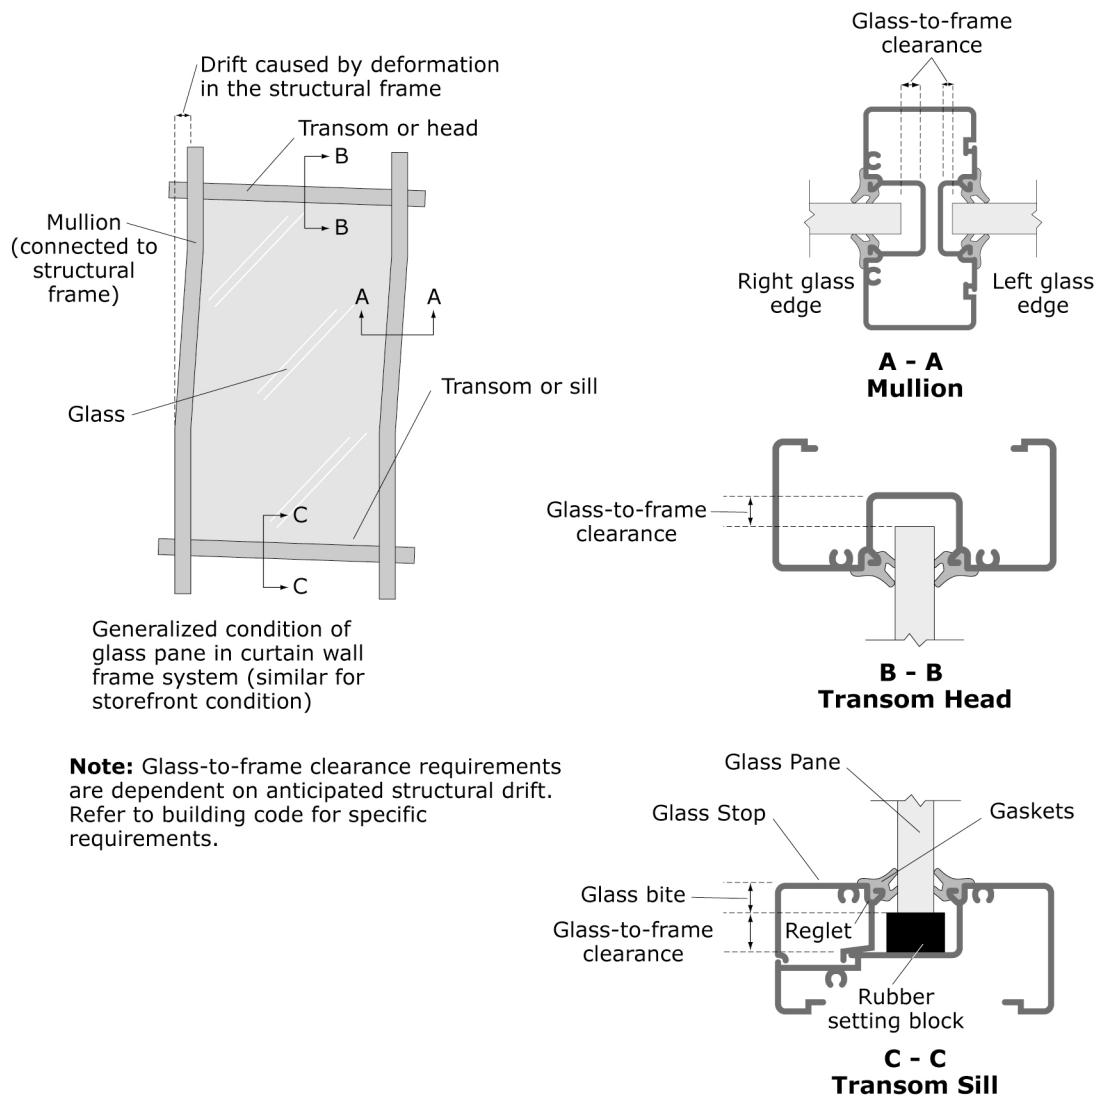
Glazed exterior wall system (ER).
